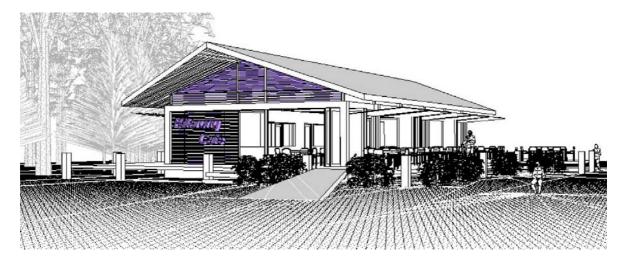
| Bilarong Reserve Food and Beverage Outlet Northwest Perspective from Entry Road
